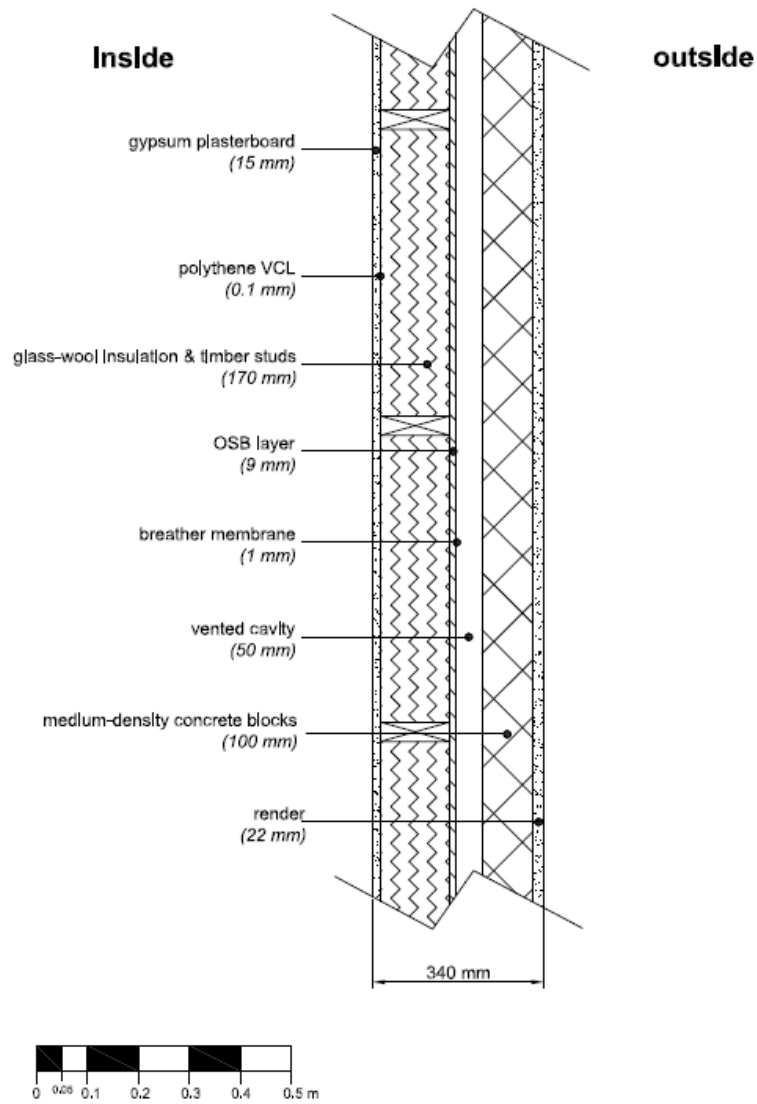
Wall A (traditional, open-panel timber frame), horizontal section.
